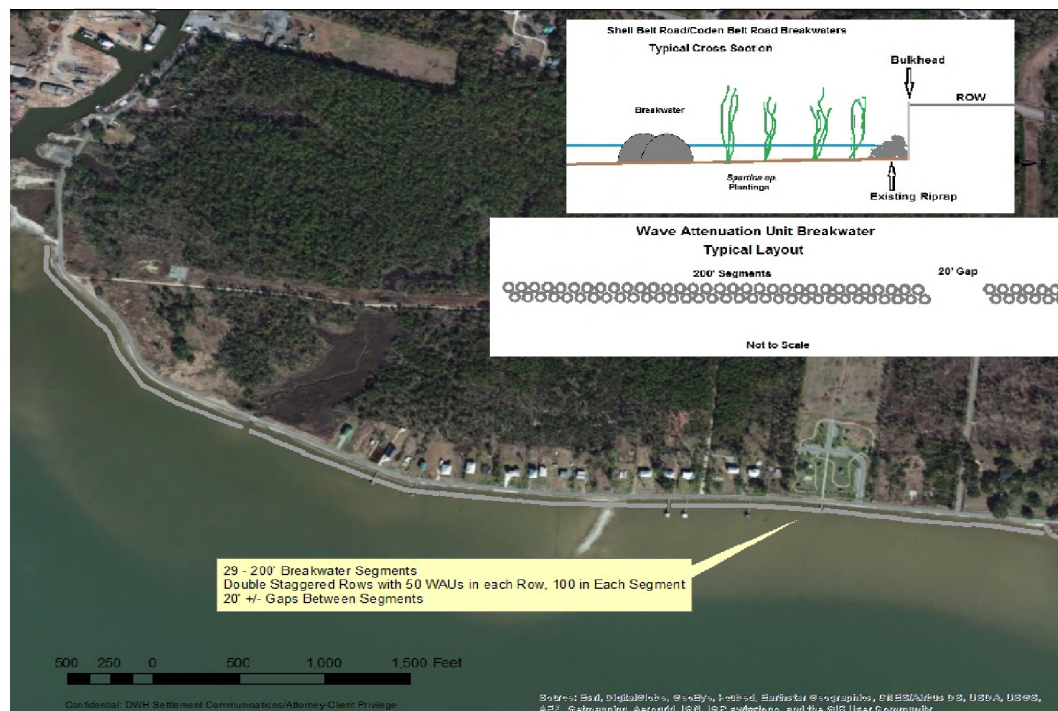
Proposed Project Layout – Coden Belt Road Living Shoreline
